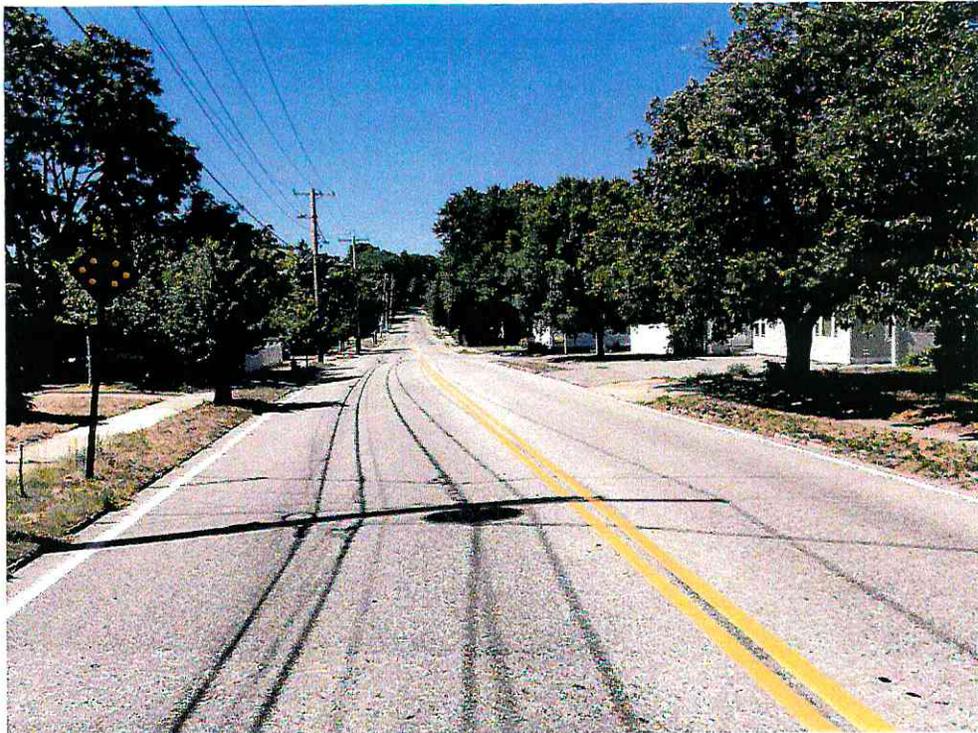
Location L – Cross St. looking west. 75' east of Adams Rd.
